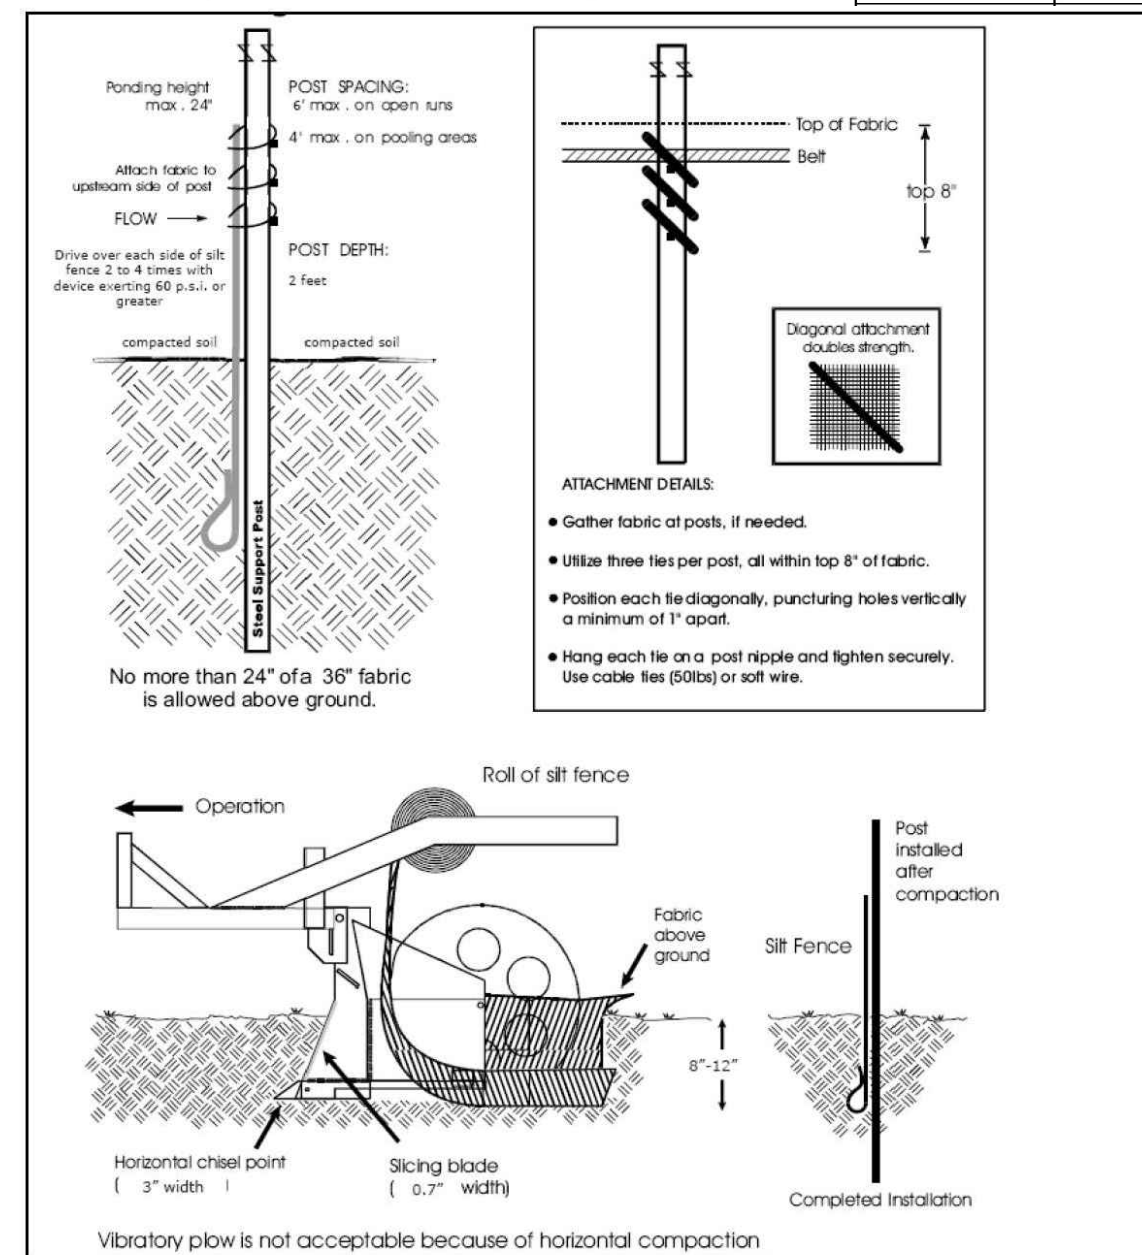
Silt Fence Slicer Installation Details (Adapted from Silt Fence That Works)
